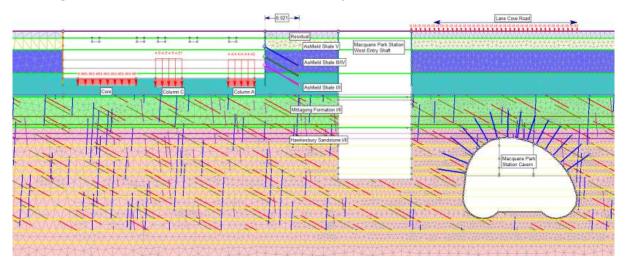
Geotechnical model for the section adjacent to station shaft and cavern
